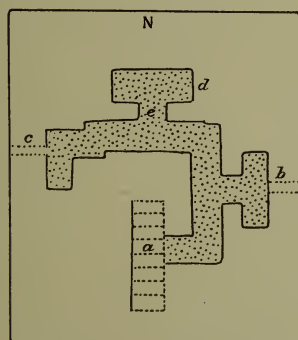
GROUND PLAN OF BLIND STORY OF TOWER.
